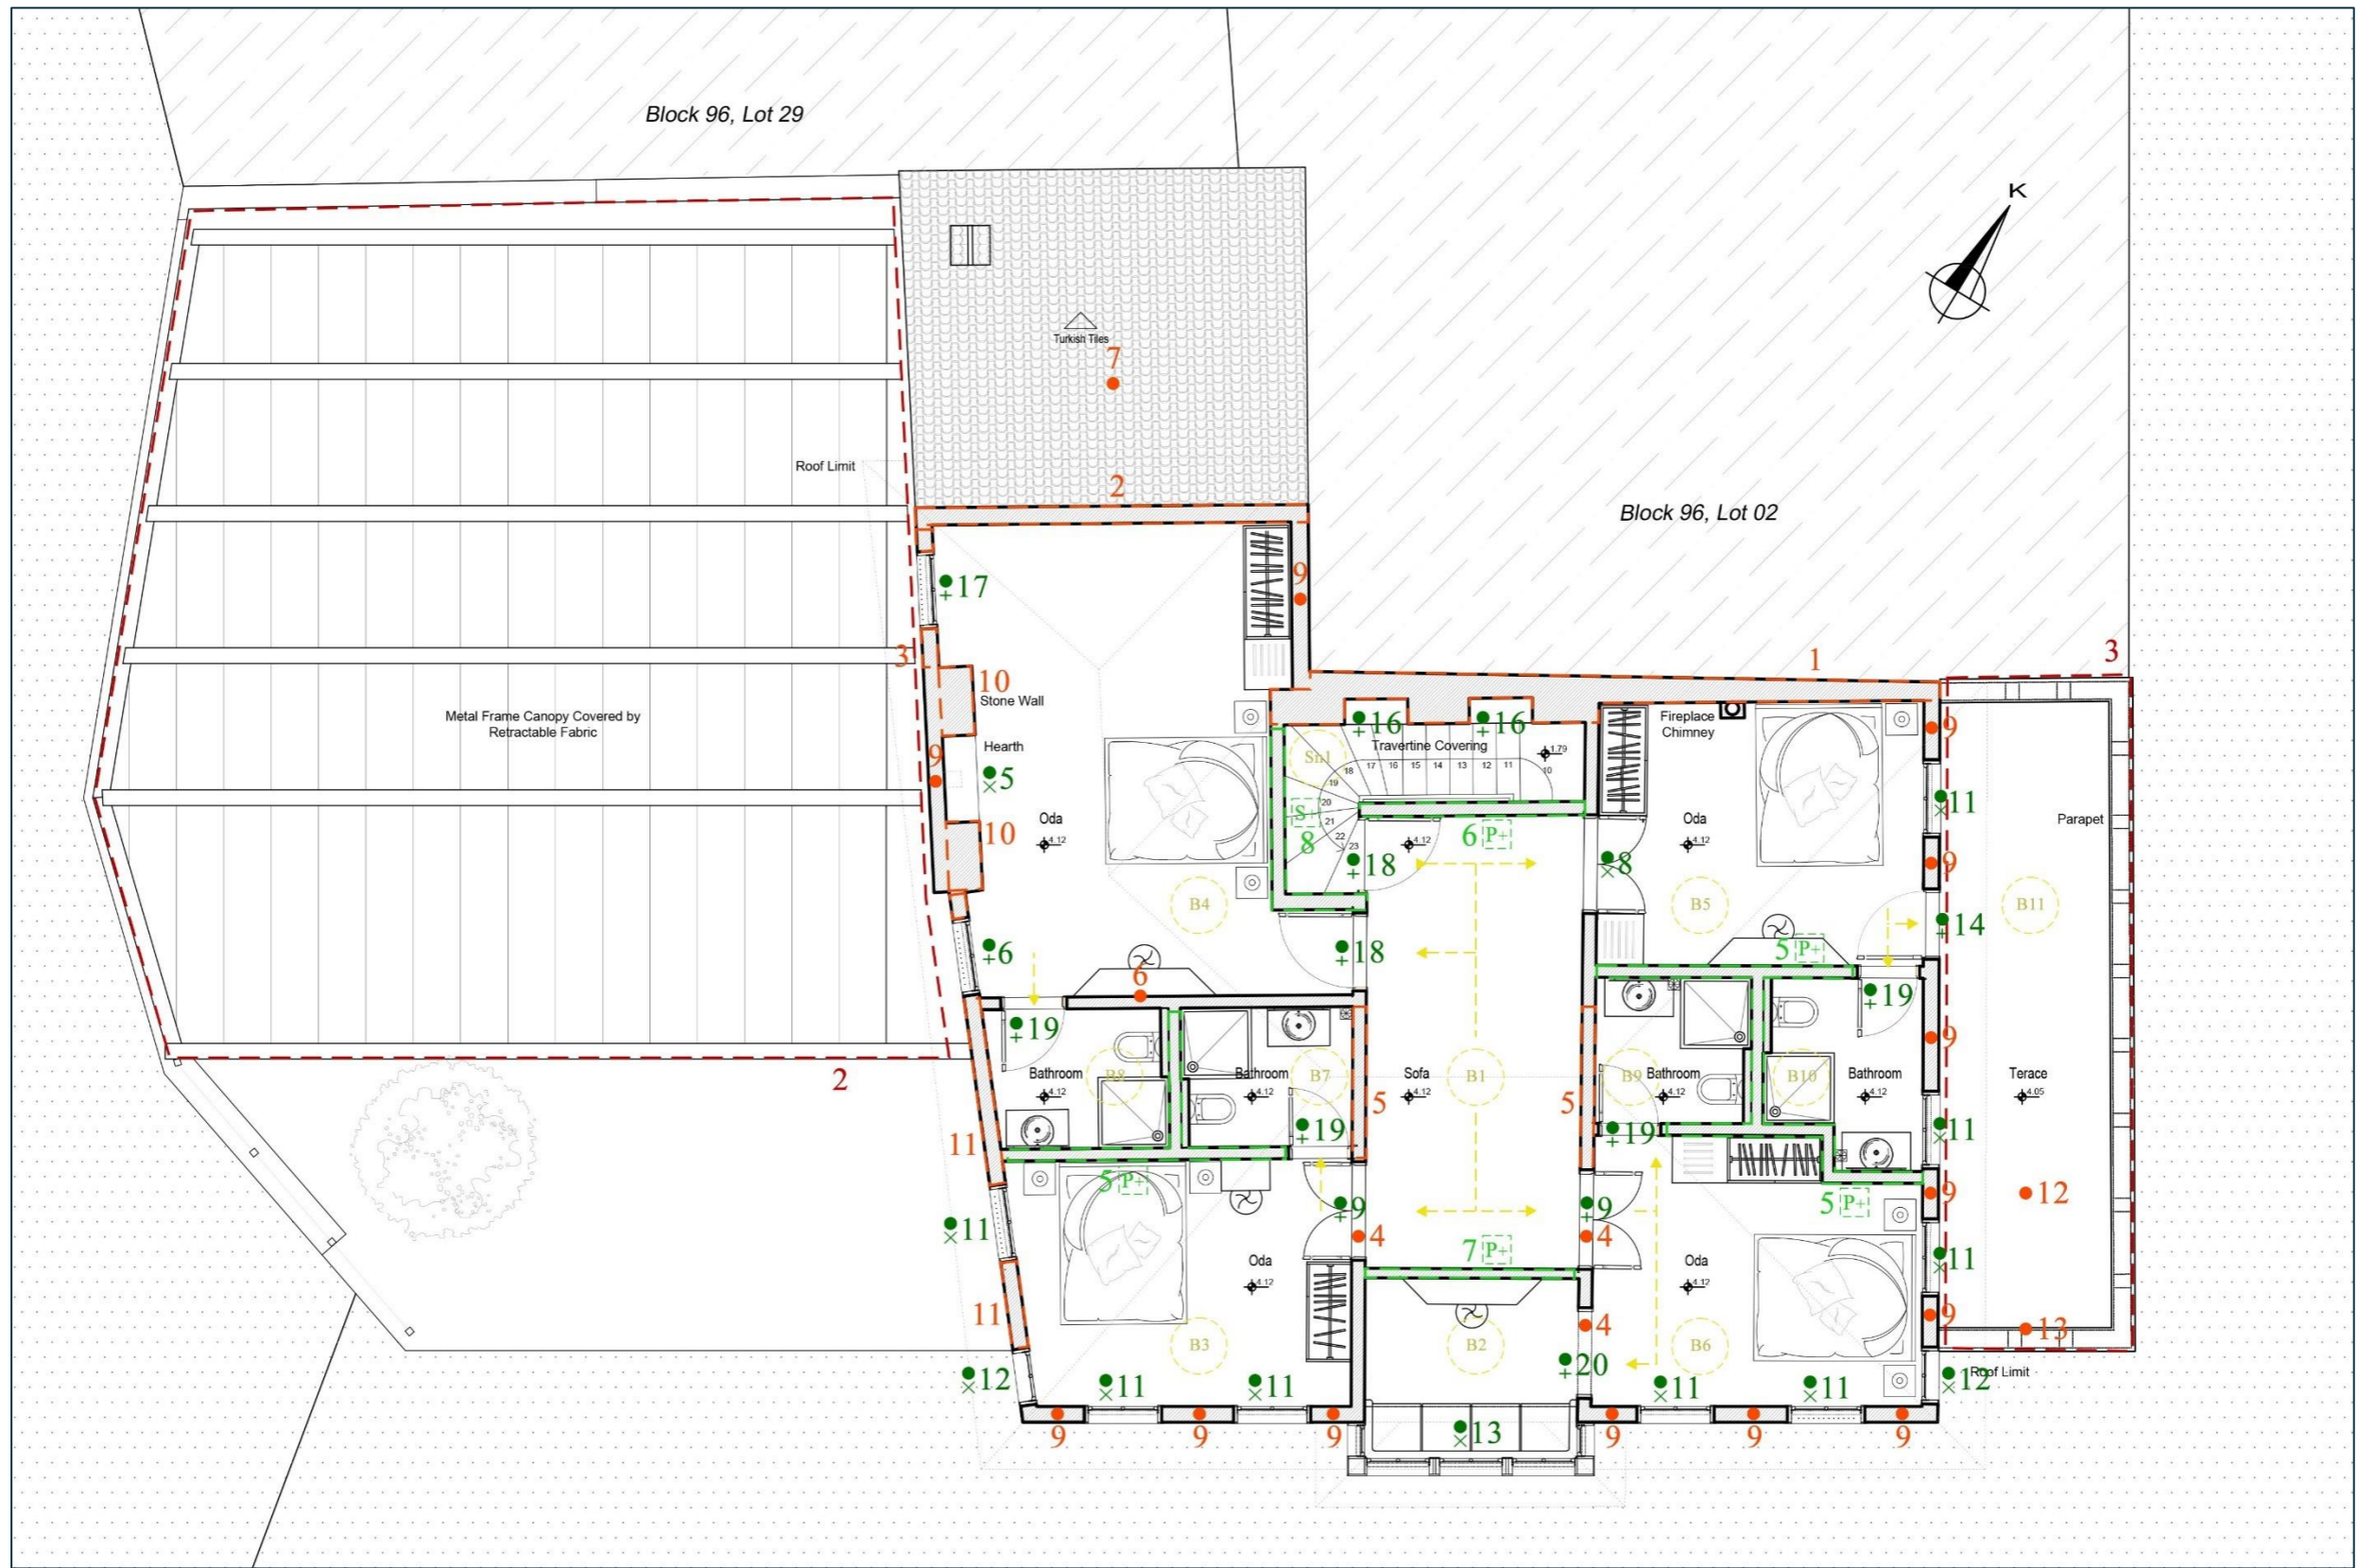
Restored first floor intervention analysis plan of Building A. Prepared by the Author.
